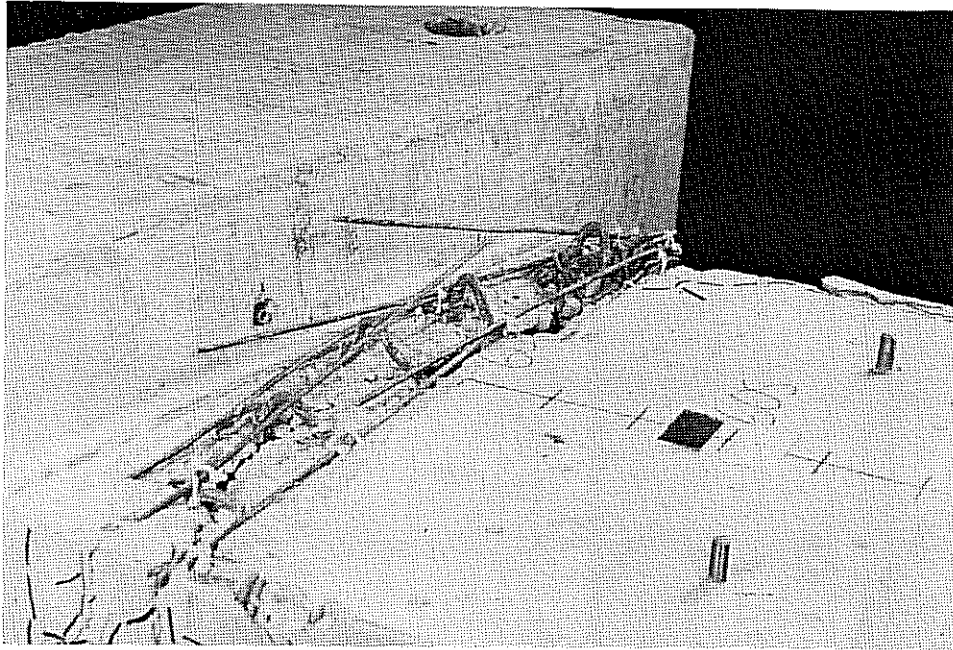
Specimen 9MLP22 Side Face Close-Up
